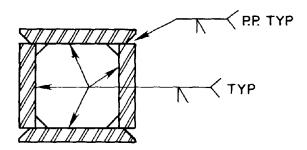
Box Column Detail Showing Internal Stiffener Plate Opposite Flanges of Moment Beam Connections (reproduced with permission of AISC-SSEC).
